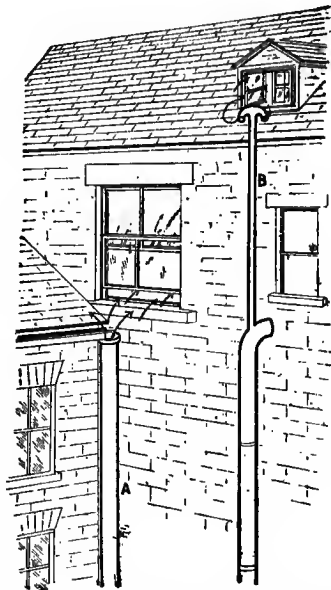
A, soil pipe communicating with sewer and opening just below bedroom window. B, Ventilator of soil pipe discharging close to the attic window.
